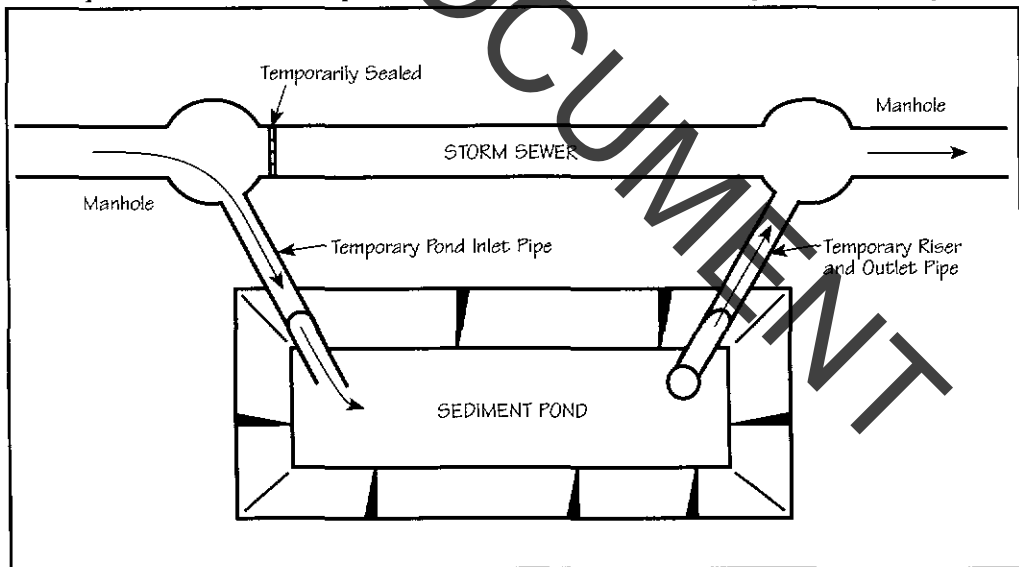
Storm drain diversion routing runoff through sediment pond
